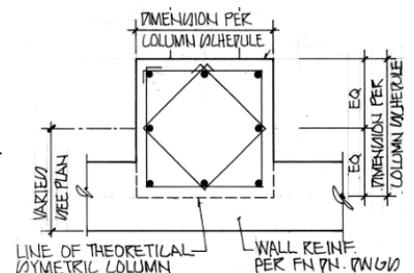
Illustration of Column Used for Support of Architectural Cylinder
